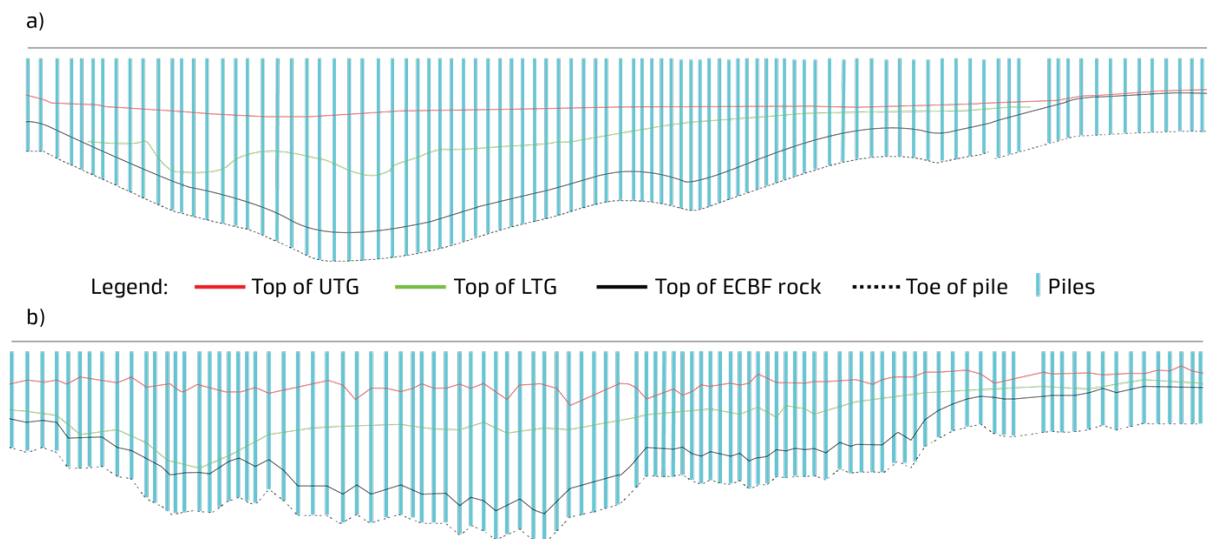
Geological long sections in the Queens Wharf to Marsden Wharf section undertaken a) for initial construction issue drawings, and b) following proof drilling.
